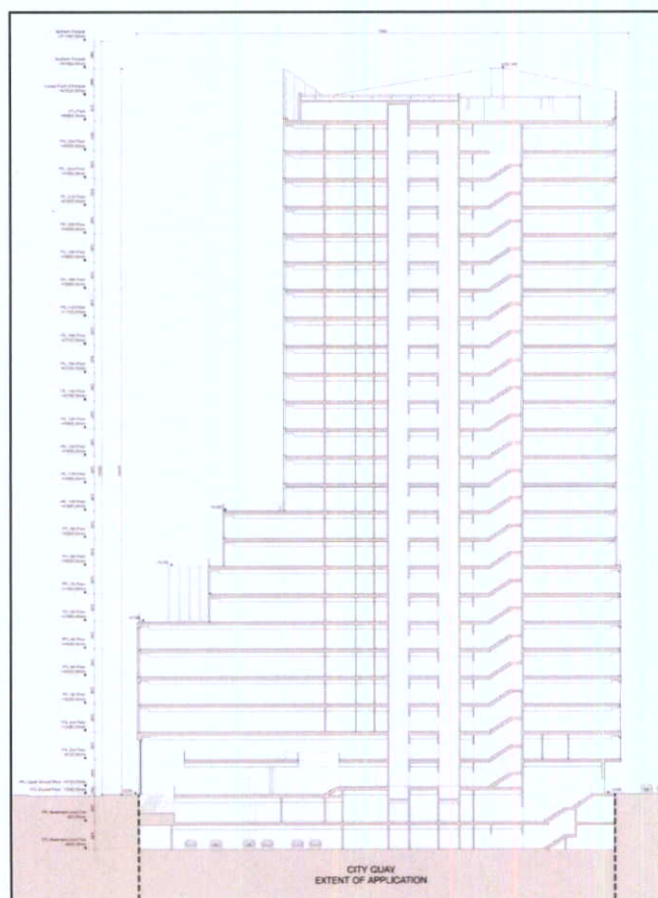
Cross Section of Proposed Development (3DDesign Bureau 2021)
